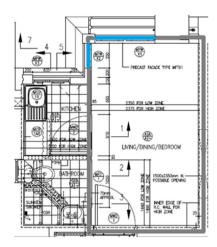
Typical Floor Plan for Modular Flat in Block 5 of Lei Yue Mun Estate, HKHA
